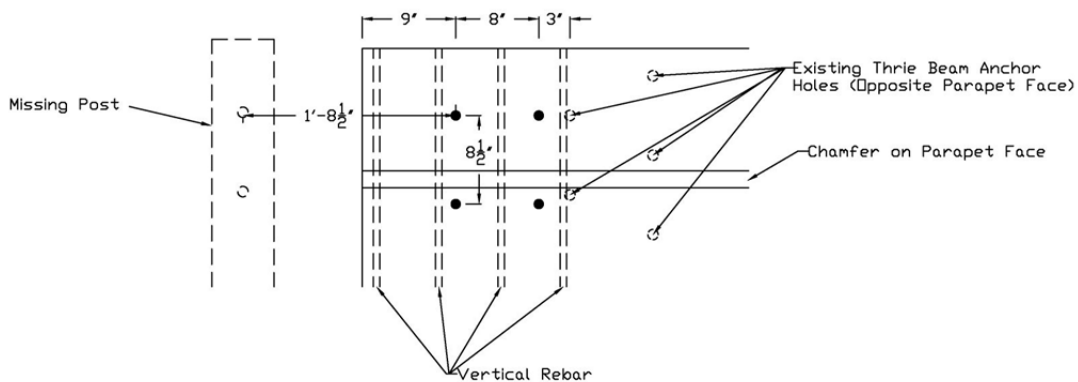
Blunt-End Parapet Retrofit - Proposed Anchor Layout
